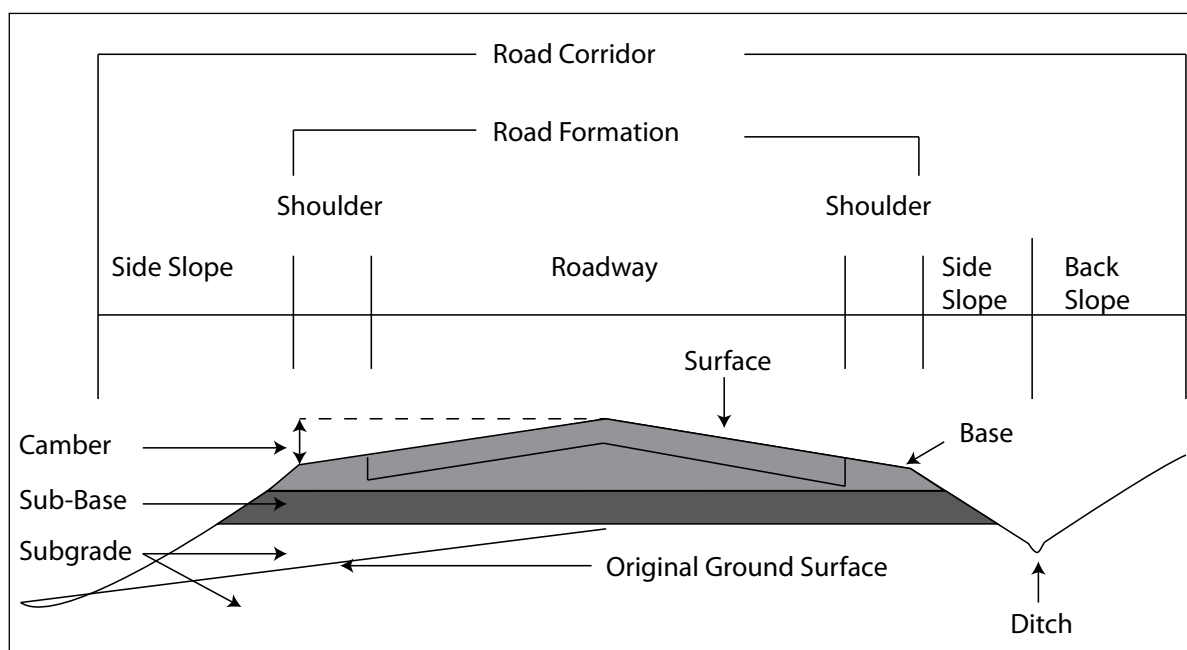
Typical Road Cross Section (Source: FAO, 1977)
